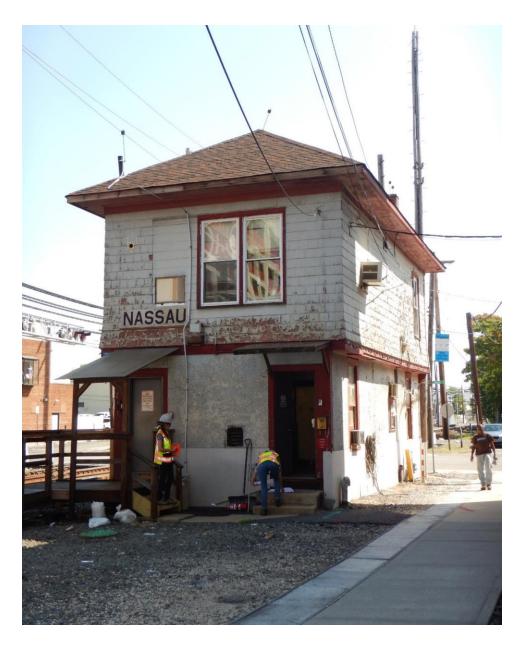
SOUTH AND WEST ELEVATIONS OVERALL
